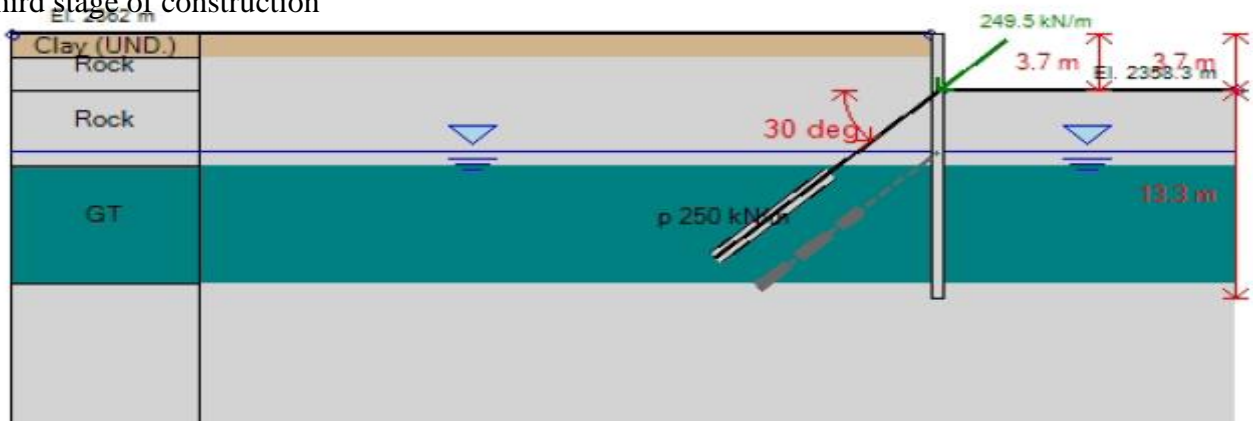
1<sup>st</sup> level anchor installation for 1.5 m spacing and 1<sup>ST</sup> anchor level 3.7m
